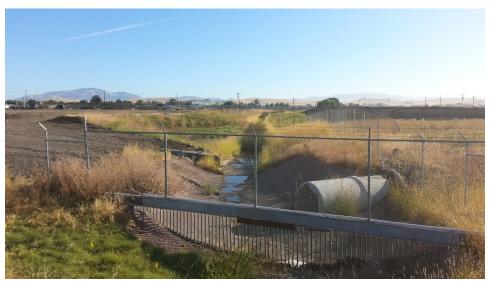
Overview of Chabot Canal and multiple culverts, viewing northeast.
